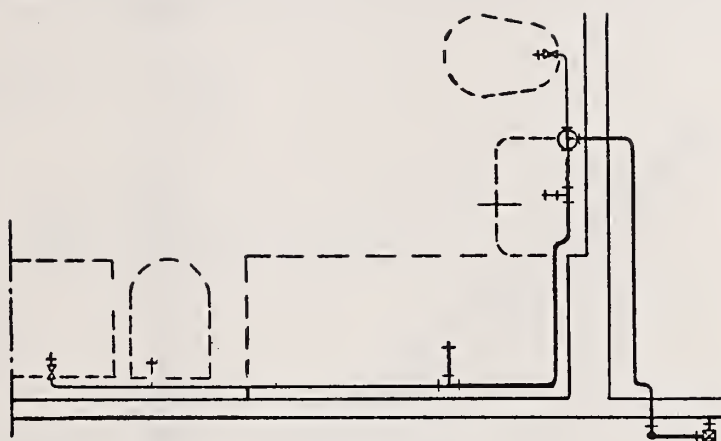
The BPA Plumbing System - Examples of "the least favorable instance" for dimensioning of facilities served. Plan and cross-section through length of pipe.
